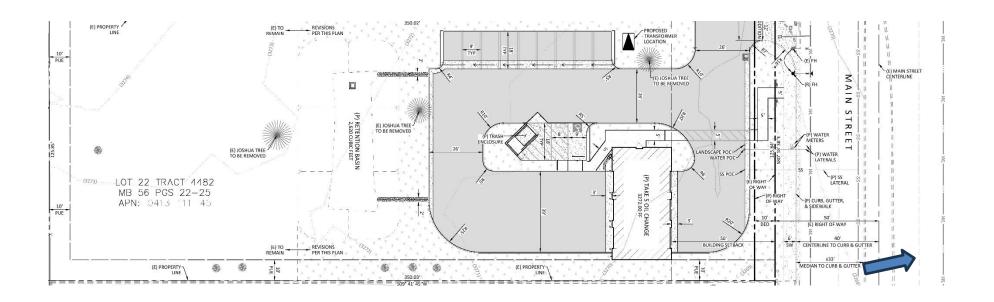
SITE PLAN OF PROJECT SITE
